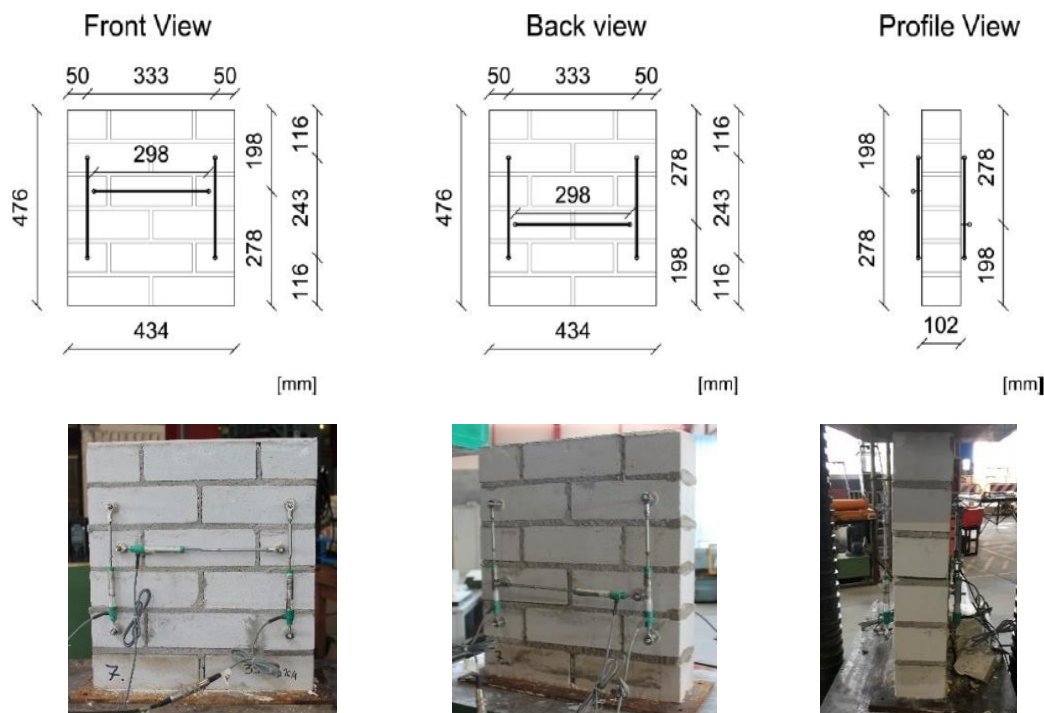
Geometry and instrumentation of test specimen, CS wallettes
